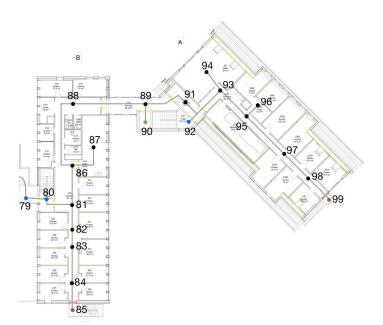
Network layout Buildings A and B on the 2nd floor.
